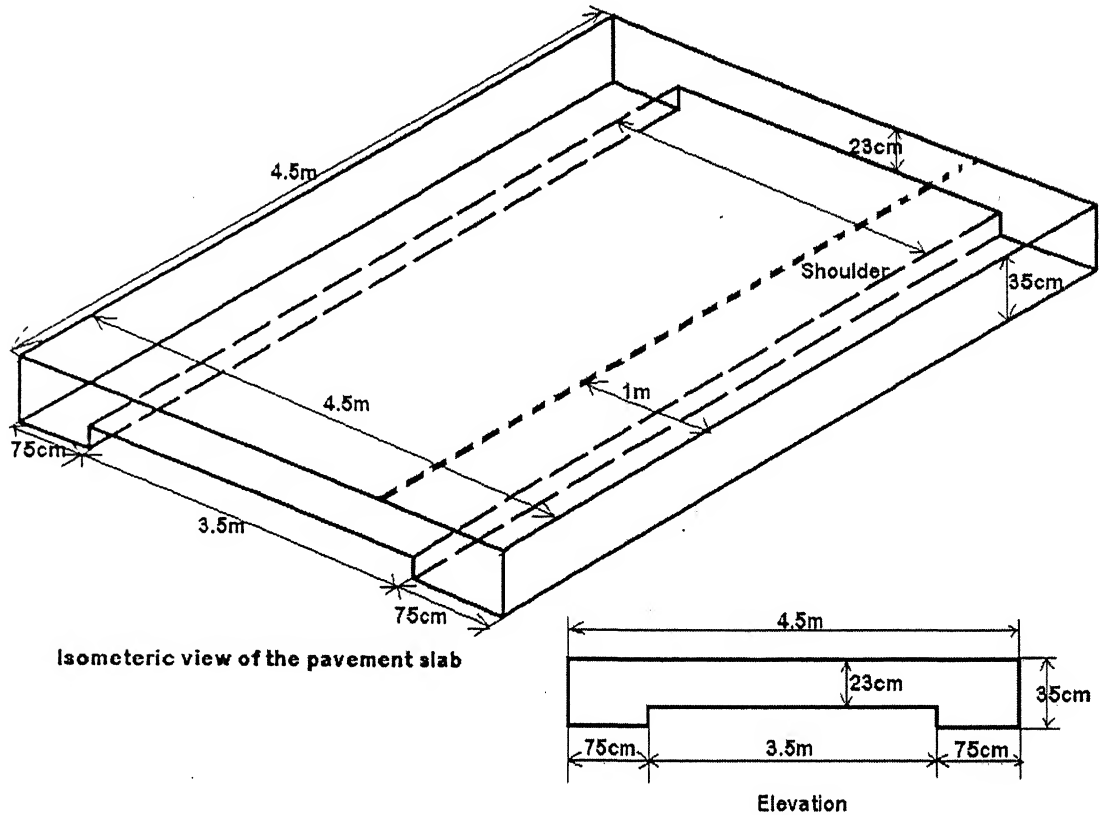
Plan and elevation of the slab with shoulder and stiffened edges
